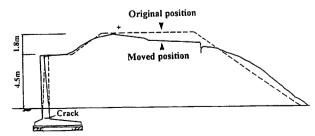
Damage to cantilever-type RC RW; embankment of freight branch along JR Tokaido Line between Higashi-Nada and Kobekou (Site CL5 in Fig. 2)
